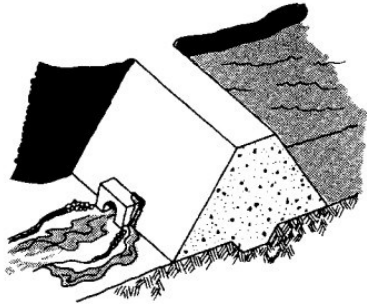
Seepage Water Exiting From a Point Adjacent to the Outlet
